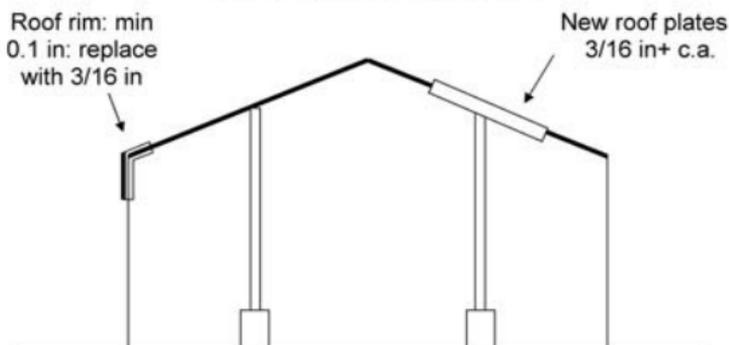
Repairs to roofs: API 653 (9.11–9.13) and API 650 (5.10)
